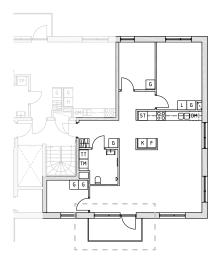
Existing floor plan, 2,5 bedroom apartment, Rebellen.
